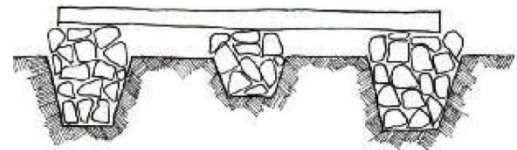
Application of the stone in Jirnal foundation, Gilan Cultural Heritage.
